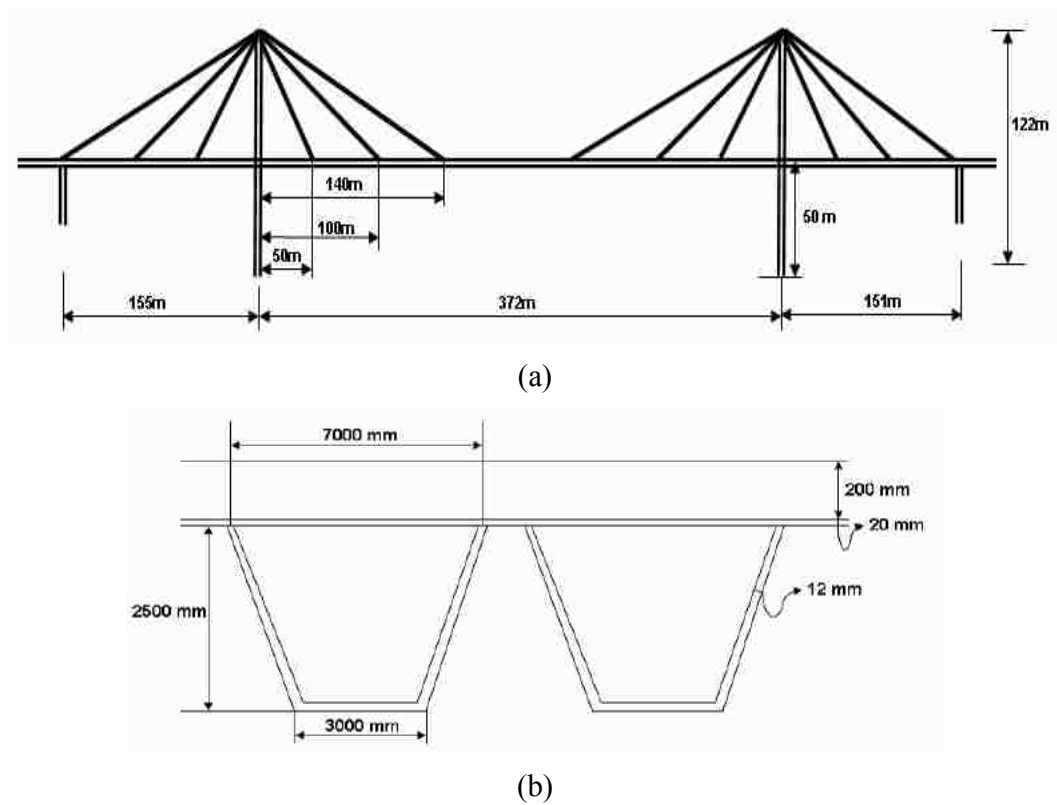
Luling Bridge (a) configuration and (b) cross section.
